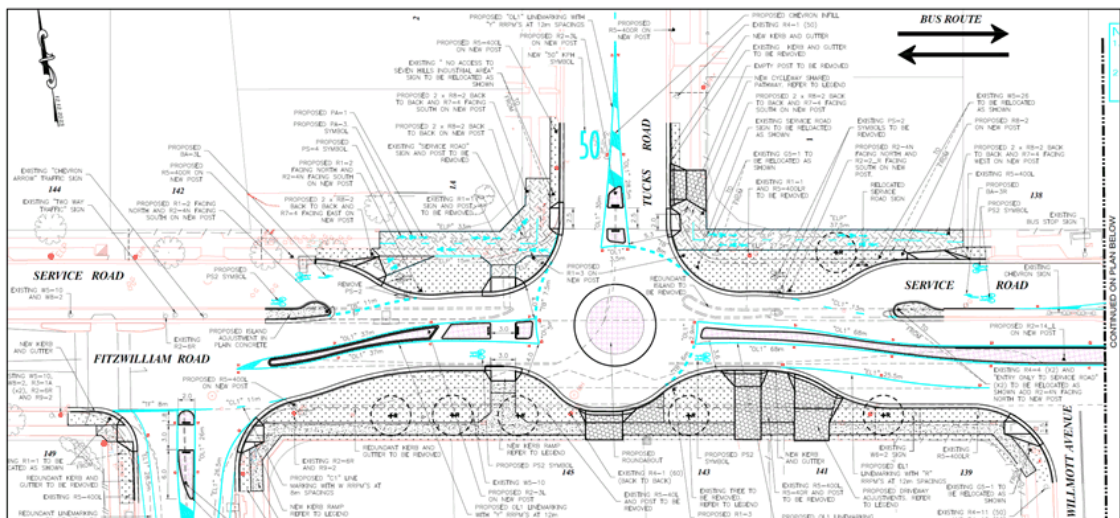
A design plan showing the proposed roundabout at the intersection of Fitzwilliam Road and Tucks Road, Toongabbie
